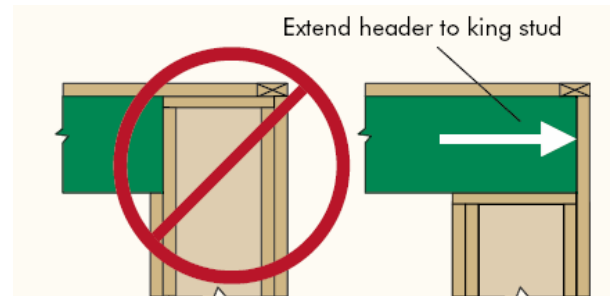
INTERMITTENT PORTAL FRAME CONSTRUCTION
